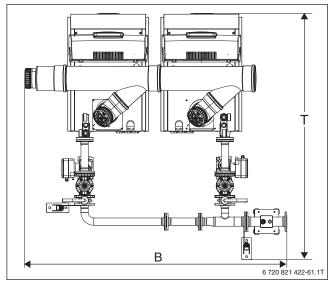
2-boiler cascade, installation side-by-side (dimensions → Table 30, page 79)
